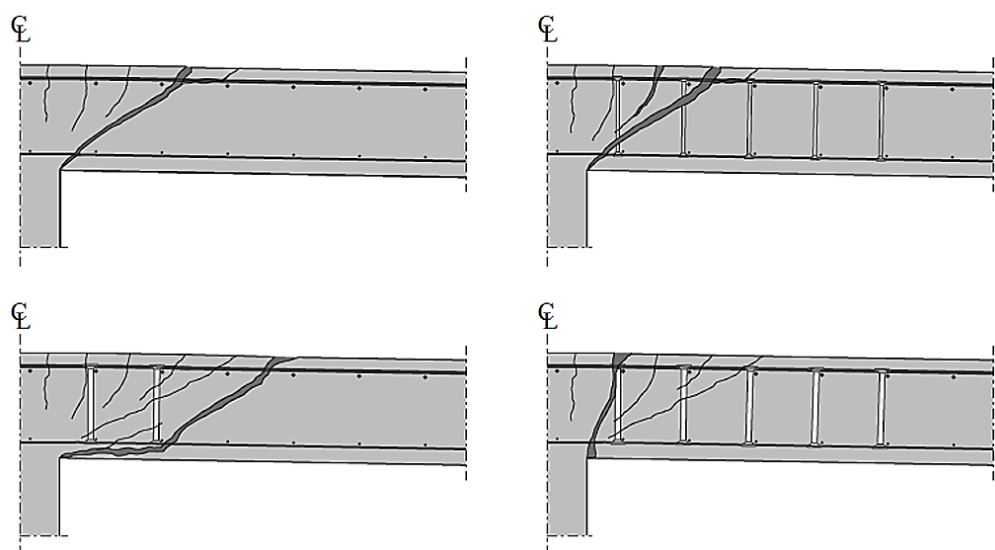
Punching shear failure modes: (top left) failure without shear reinforcement; (top right) failure inside the shear-reinforced zone; (bottom left) punching outside the shear-reinforced zone; (bottom right) failure of the compression strut at maximum resistance, adapted from [9]
